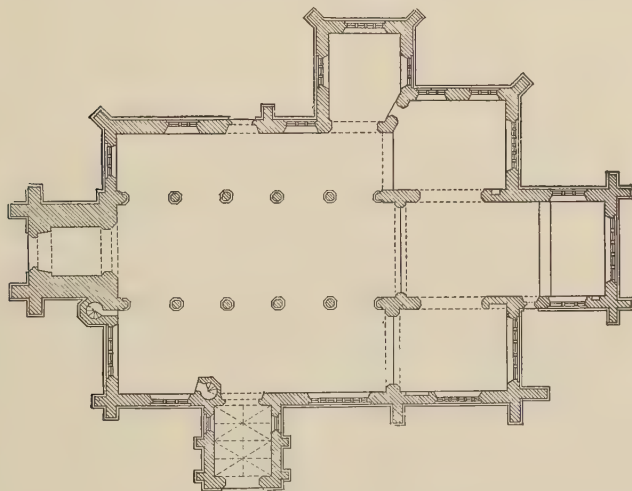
PLAN OF OUTWELL CHURCH, NORFOLK
